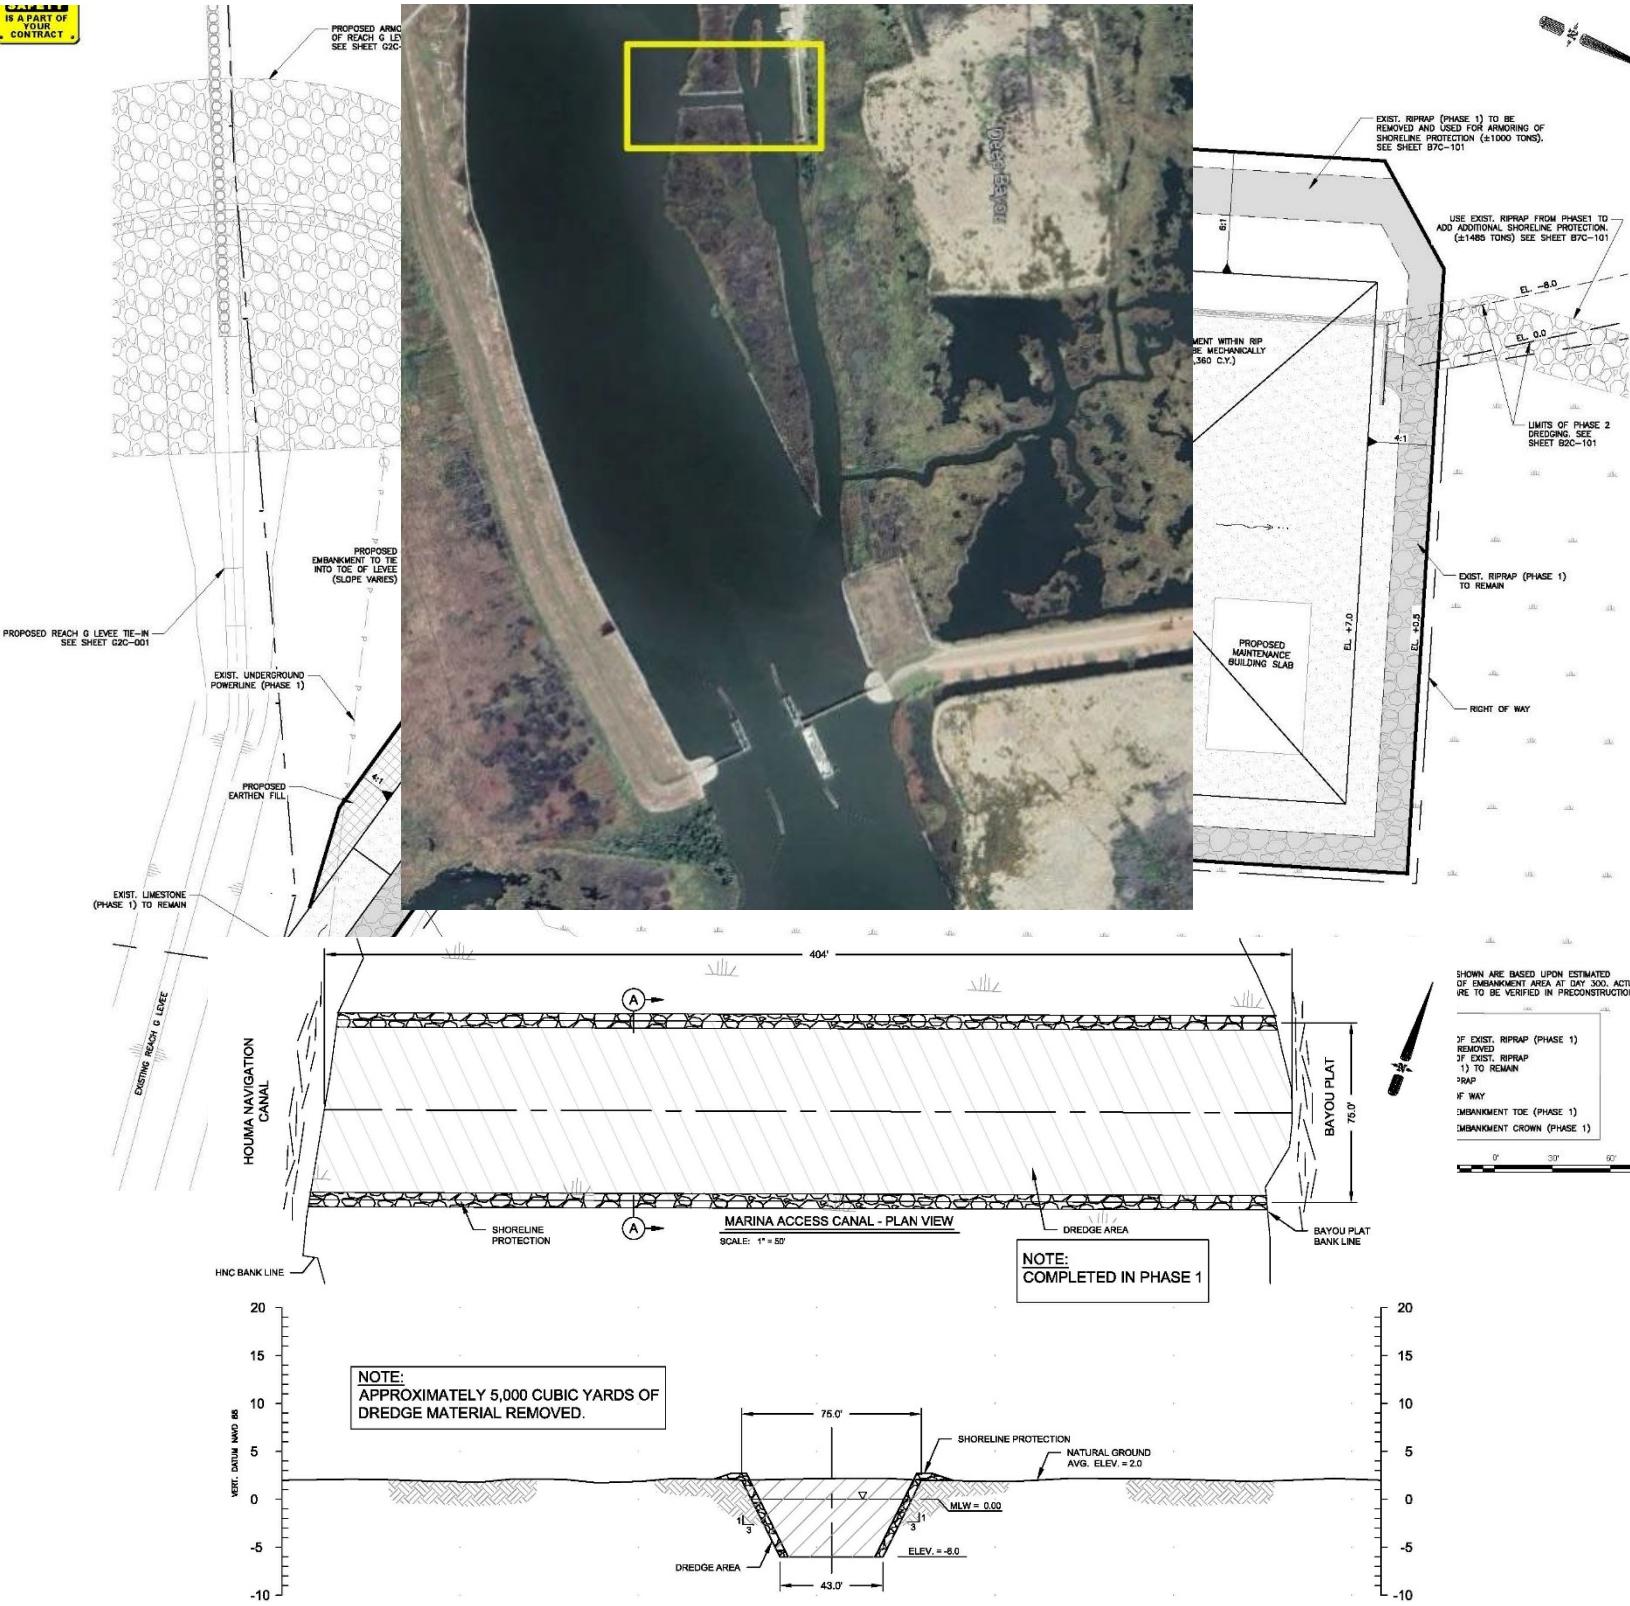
Marina access channel location (in yellow) and plan view and crosssection
